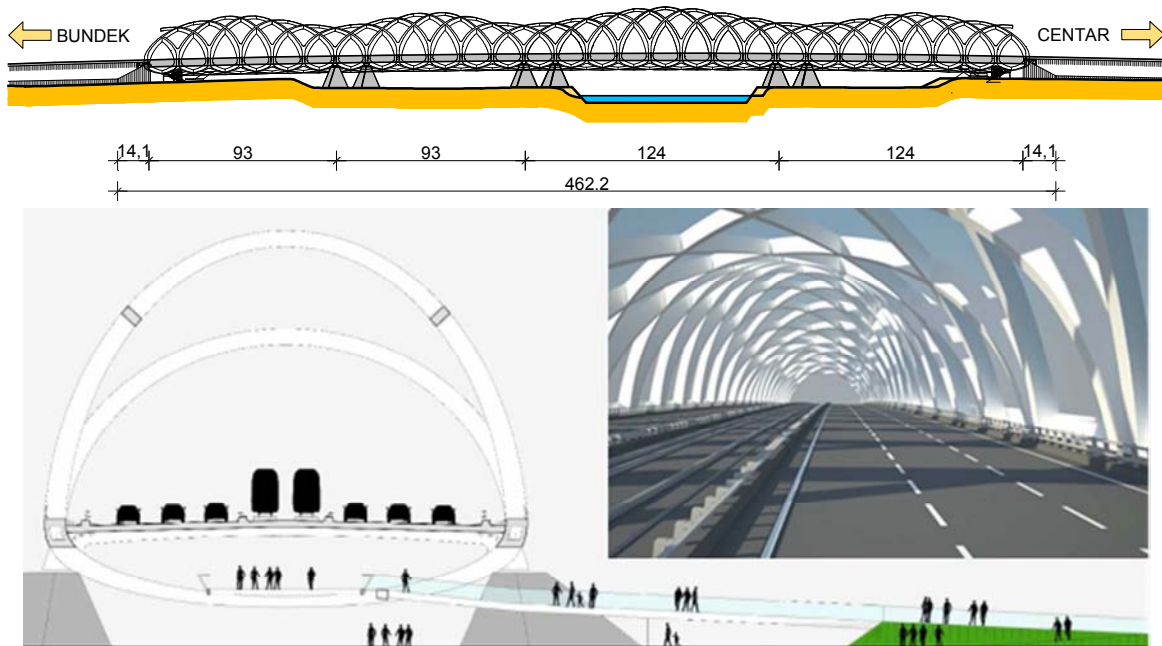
BundeK City Bridge: longitudinal layout, vertical organisation of space and view of steel structure
